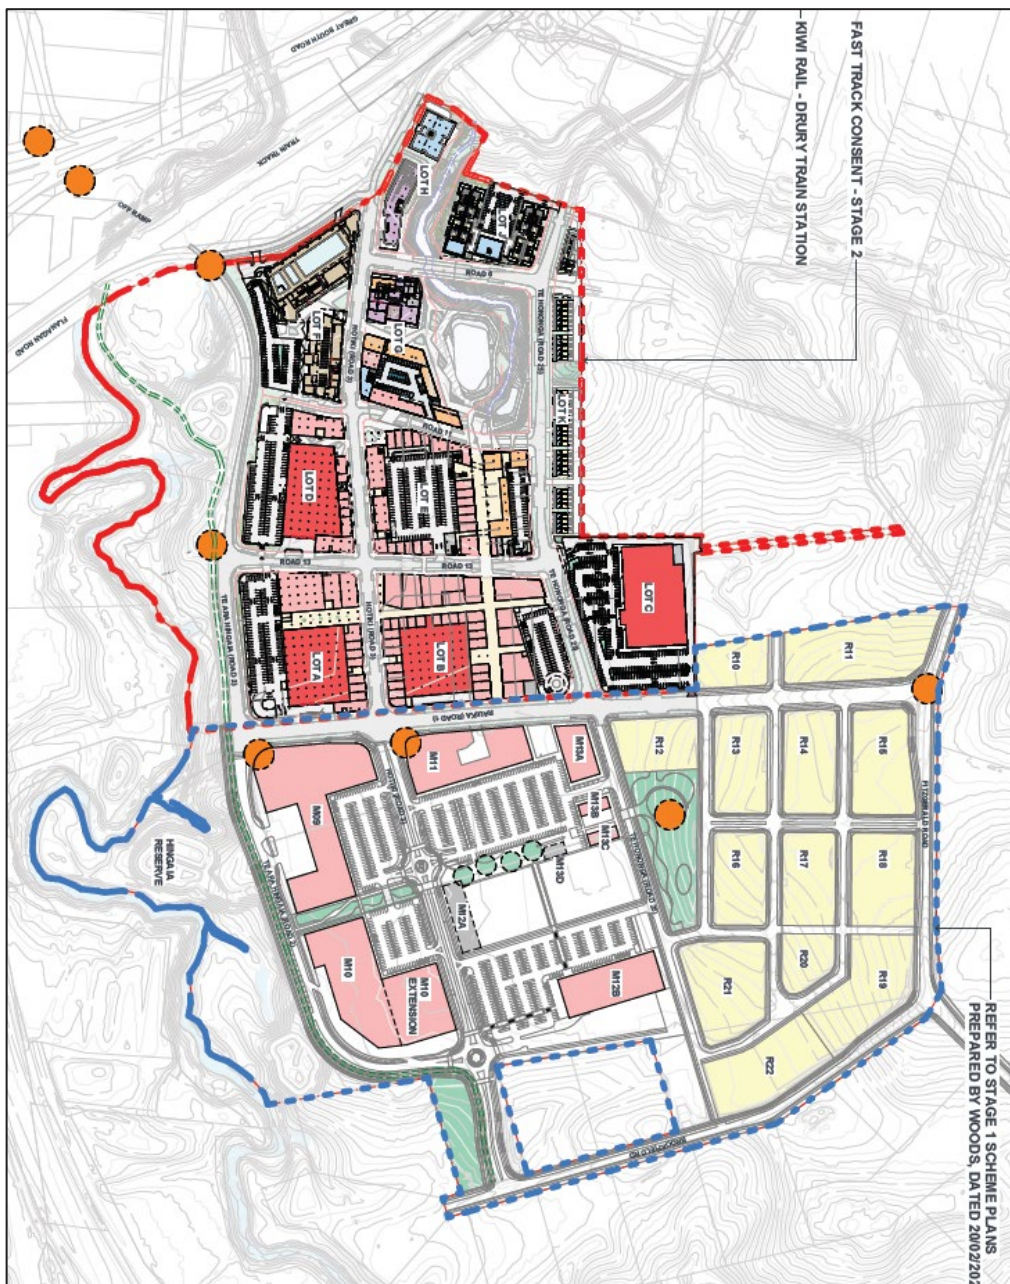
General layout plan of Drury Metropolitan Centre with the approved Stage 1 Fast Track Consent area outlined in blue and the proposed Stage 2 project area outlined in red.
